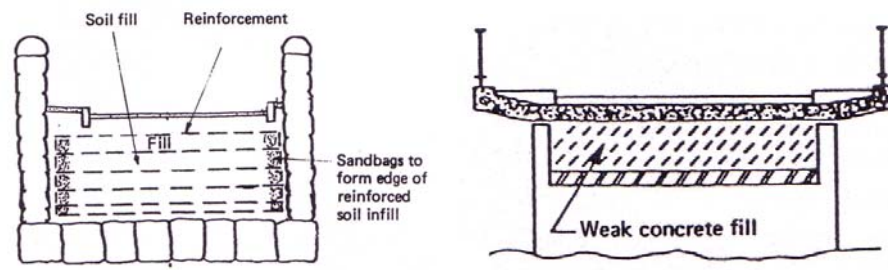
Strengthening of the fill material used for reducing the pressure on the spandrel walls
